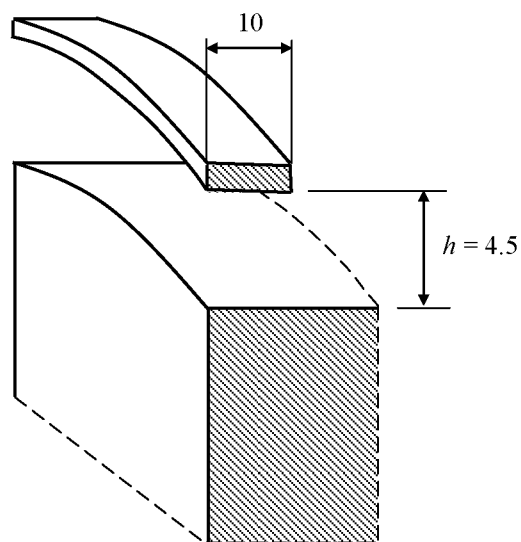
Sketch of the cantilever parapet tested. Dimensions are in millimetres.
